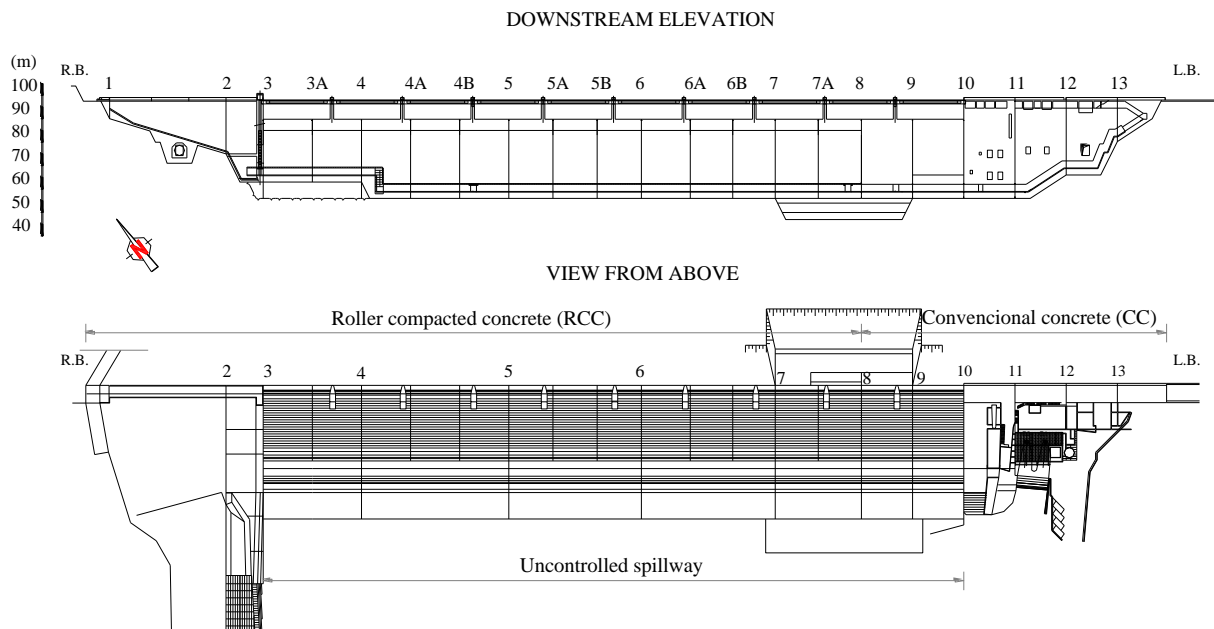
Downstream elevation and plan of Pedrógão dam.
